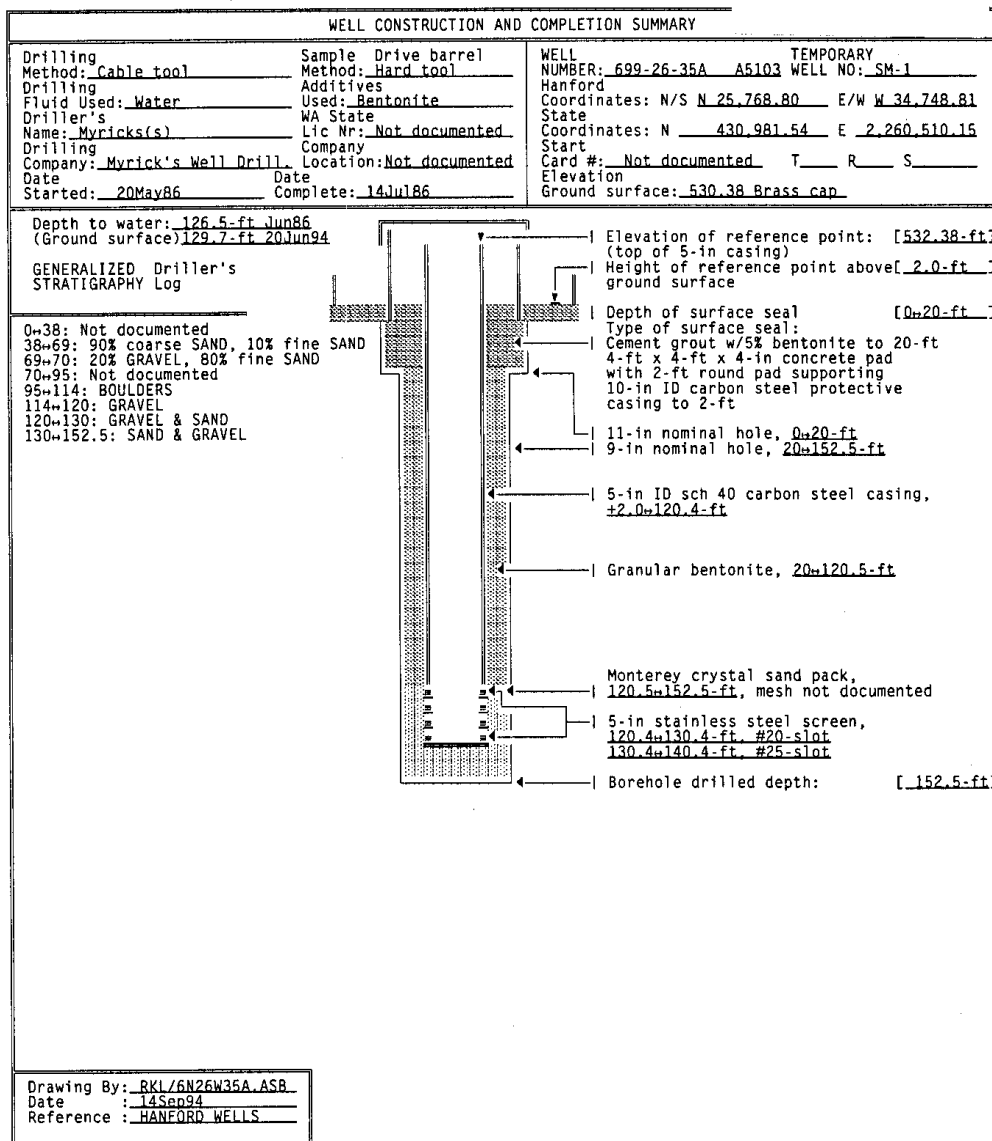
Well 699-26-35A Construction and Completion Summary (1 of 2)
